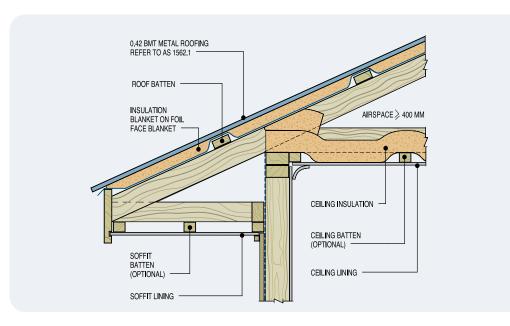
Pitched 0.42mm BMT Corrugated roof with R 3.0 Insulation. Section through roof
